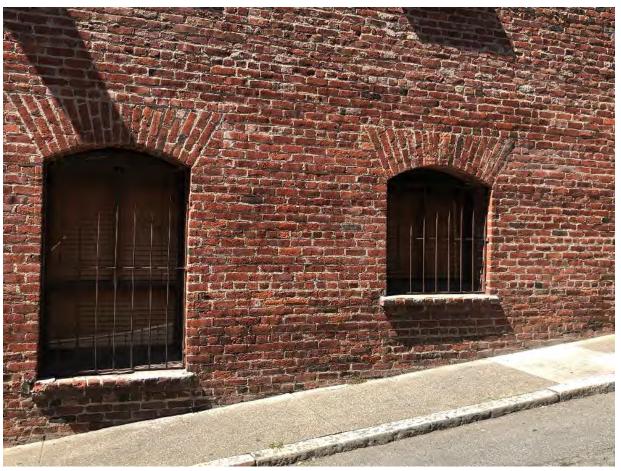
Grilles at windows at Osgood Place façade, 2020. Looking west.
